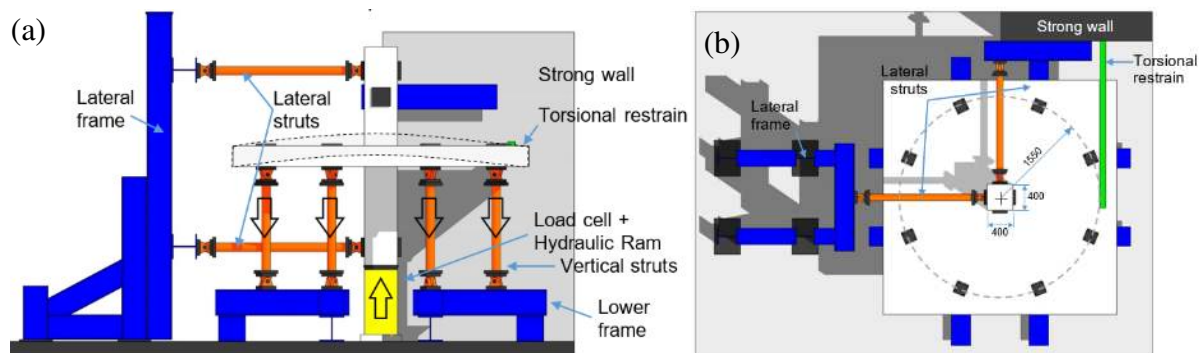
CL Test Setup: (a) front, (b) top view, dimensions (mm).
